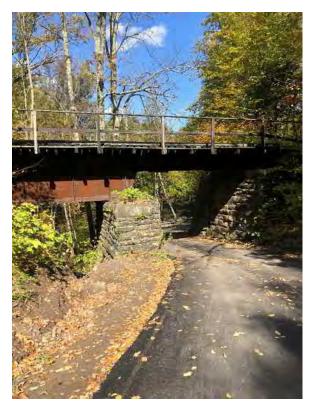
Railroad bridge over Stream 5 (to left) and Mill Street.
